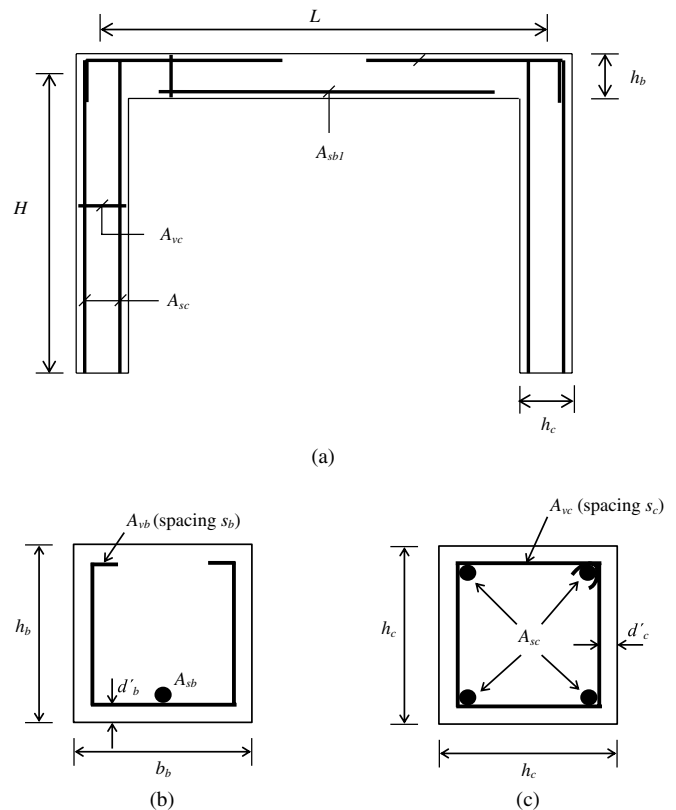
Schematic of a frame structure and section details: (a) frame structure; (b) beam section; (c) column section
